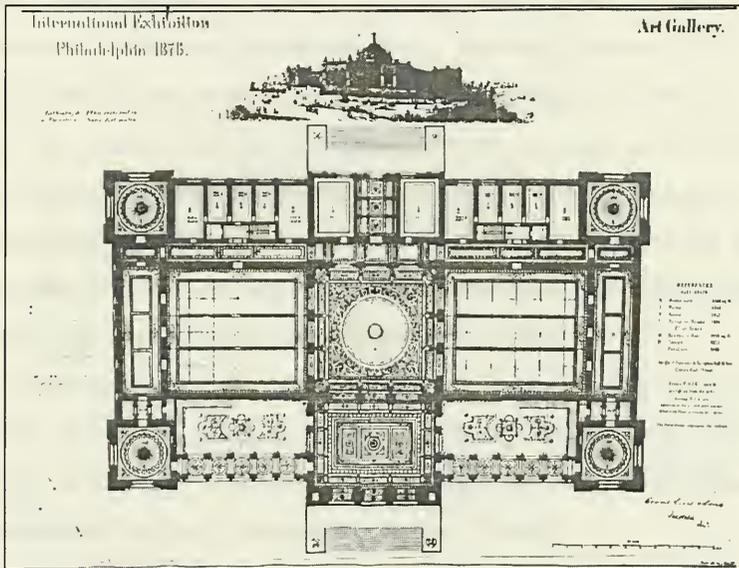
Lithograph of plan and reflected ceiling plan of Memorial Hall, 1876. (Trumbull, "Memorial Hall: A History," 105.)
